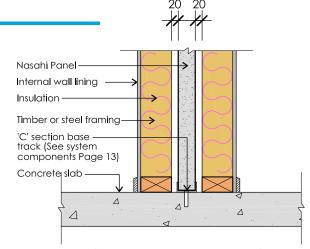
Base Slab Connection (Cavity Between Panel & Frame)
